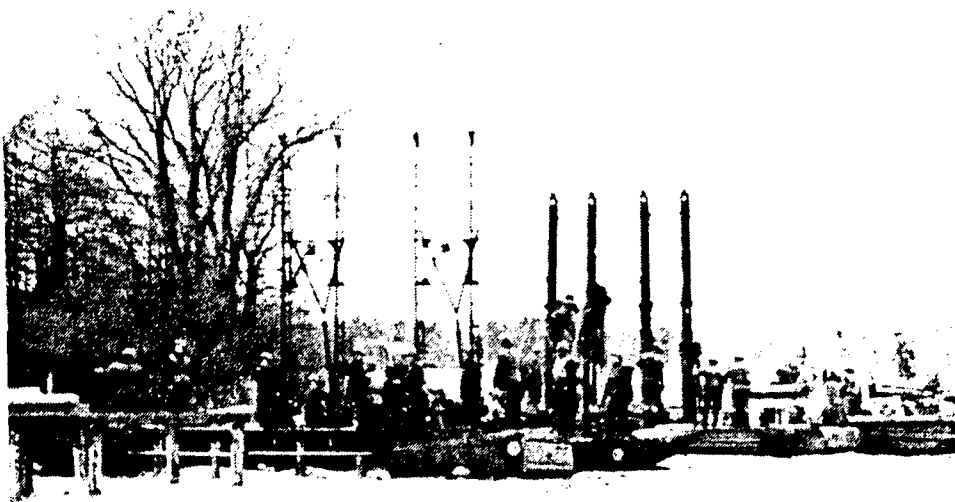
Construction of an emergency bridge from both banks in collaboration with a Soviet bridge building unit.
